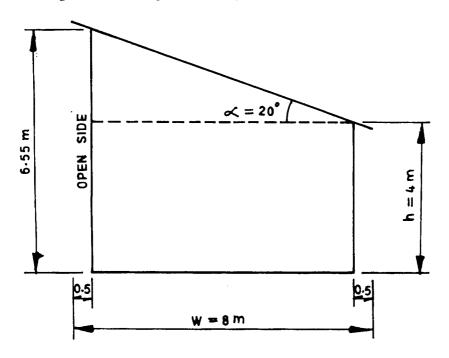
A RECTANGULAR CLAD BUILDING WITH MONOSLOPE ROOF
